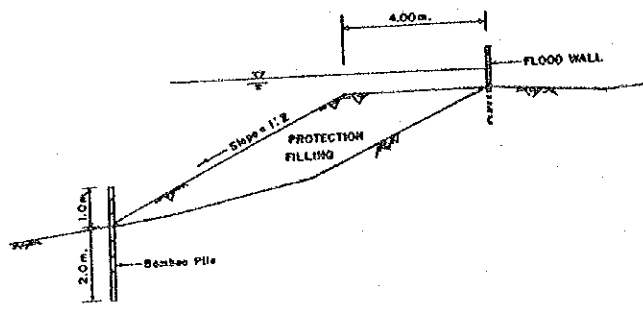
(3) LONGITUDINAL SECTION OF FLOOD WALL : DND (DS AND DE)
